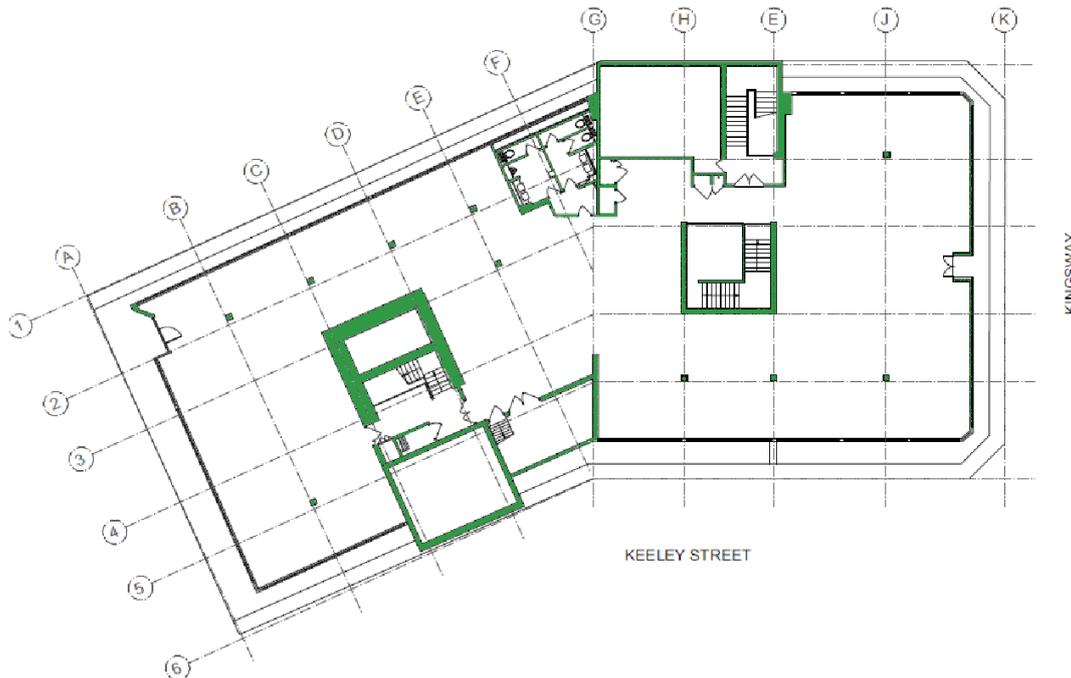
Seventh floor significance plan. The entire floor was added in the late 1980s and is of no heritage interest.
